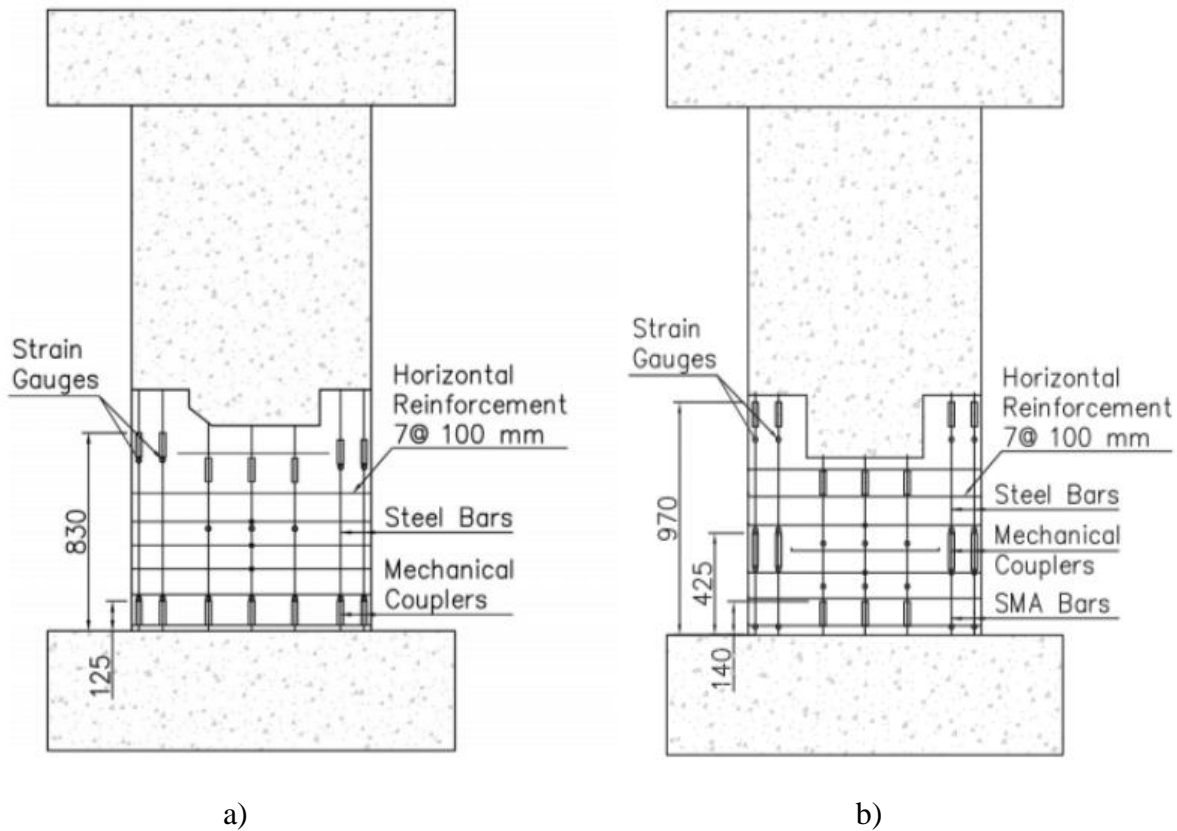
Repaired reinforcement layouts for a) RW1-SR and b) RW2-NR (L. Cortés-Puentes et al., 2018).
